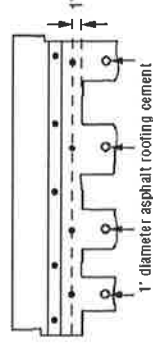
Fastening Presidential and Presidential TL Shingles on steep slopes.
